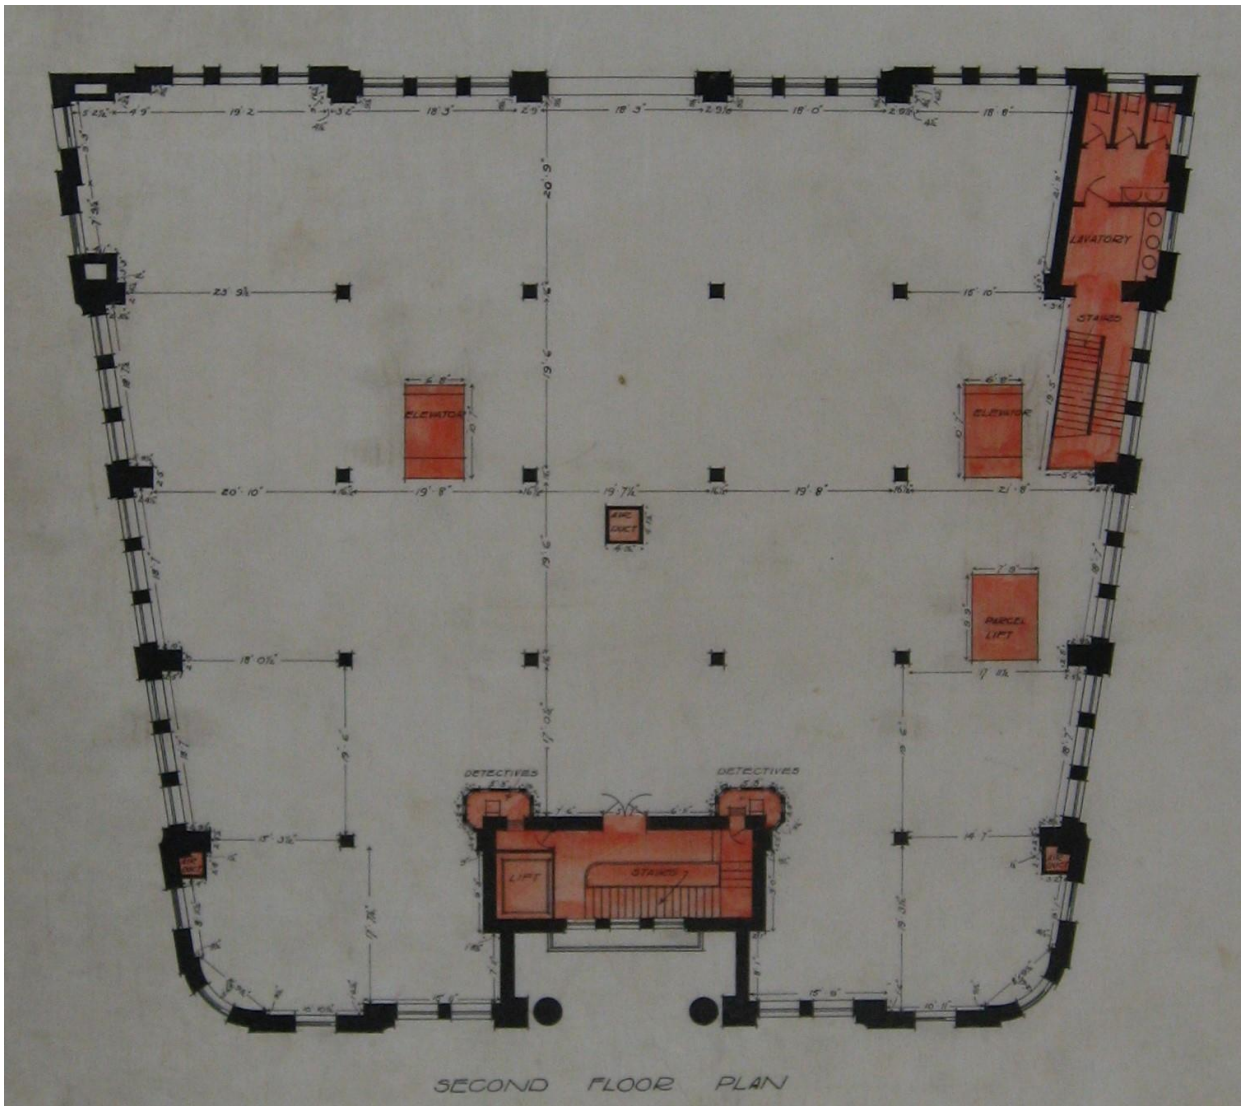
Mail Sorting Office Central Railway Station Sydney, second floor plan, 1914. Signed by George J Oakeshott (works Director).
